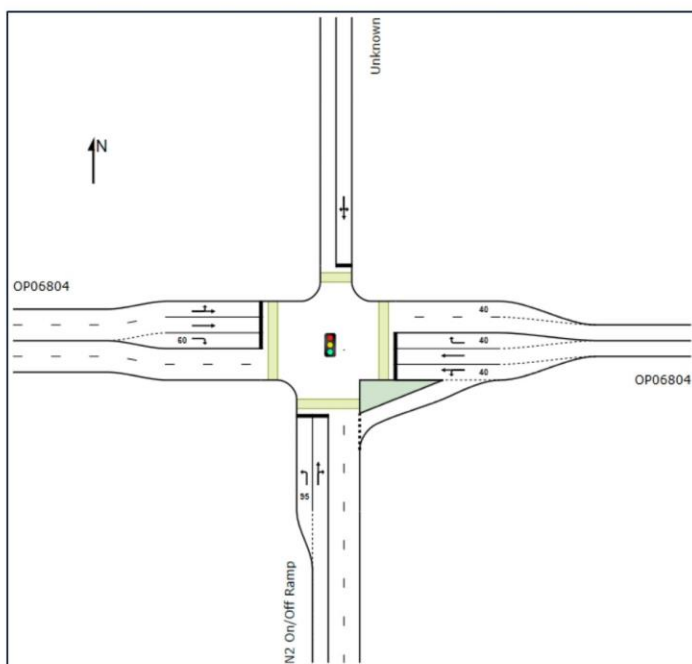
OP06804 and National Route 2 Southbound Carriageway Ramp Terminal planned Intersection
